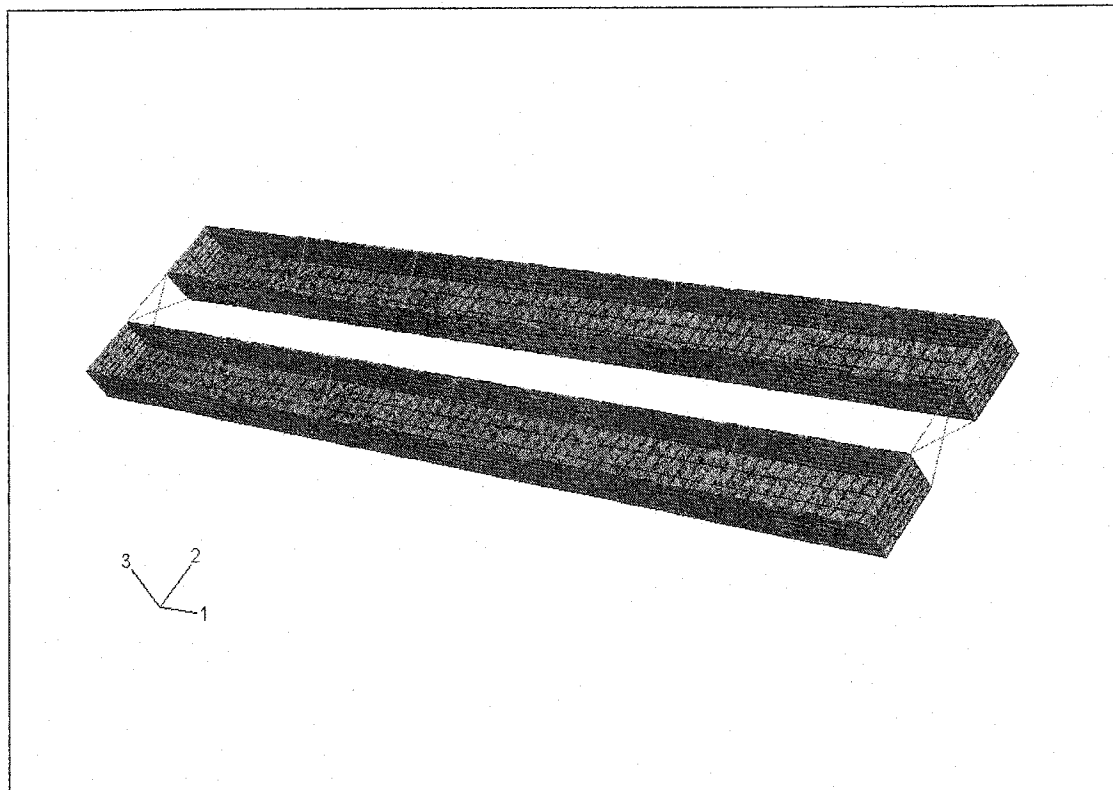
ABAQUS model view of bridge model M3 without concrete deck
